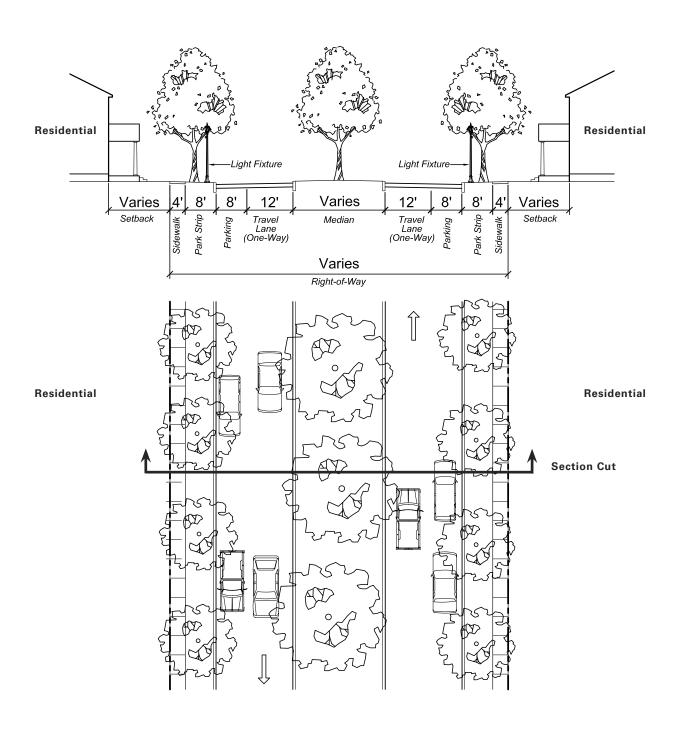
Proposed Section and Plan: Neighborhood Street D
